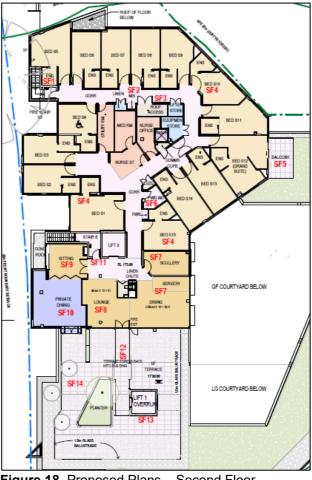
Proposed Plans – Second Floor Source: Morrison Design Partnership Pty Ltd
